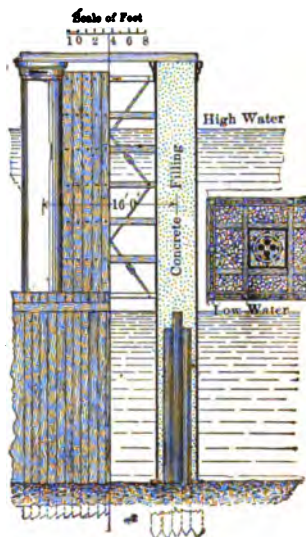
PIER OF TWO CYLINDERS, VICTORIA BRIDGE.
